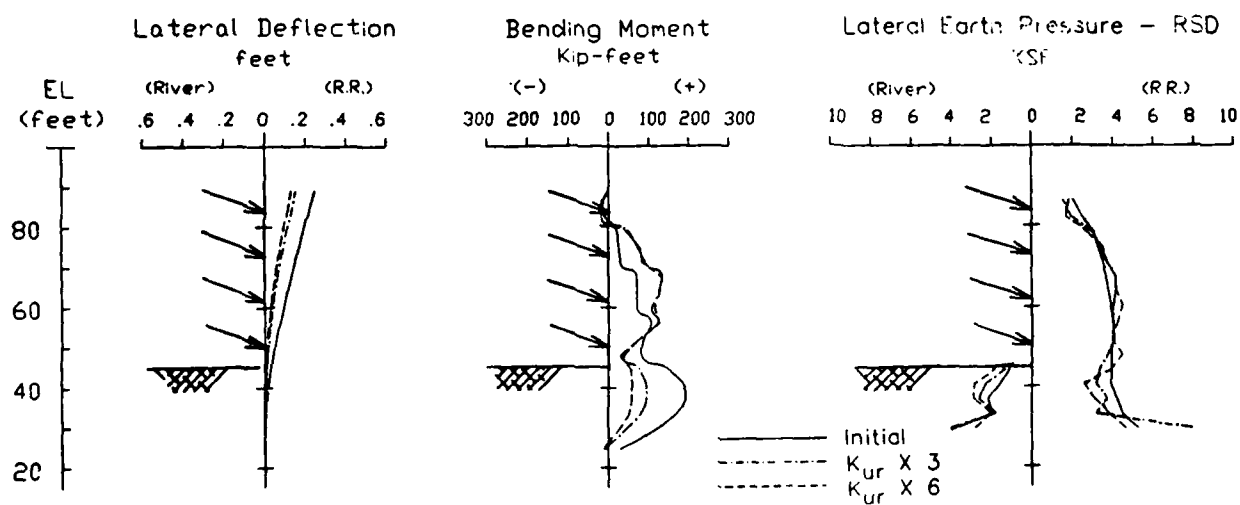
Deflection, moment, and earth pressure for Panel 11, load step 13; prestress anchor at el 49.67 ft
